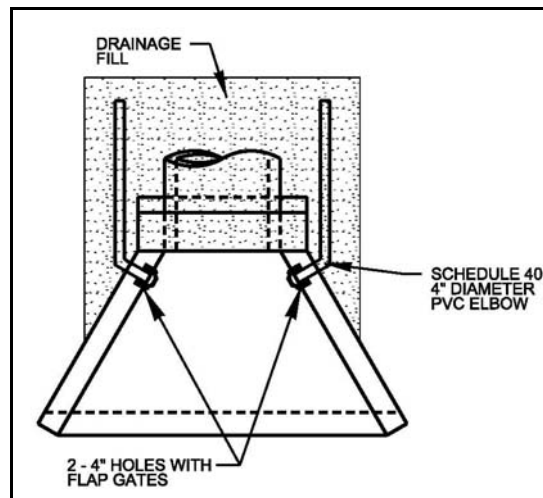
PVC elbows used to align drainage fill drain pipe parallel to pipe penetration.
